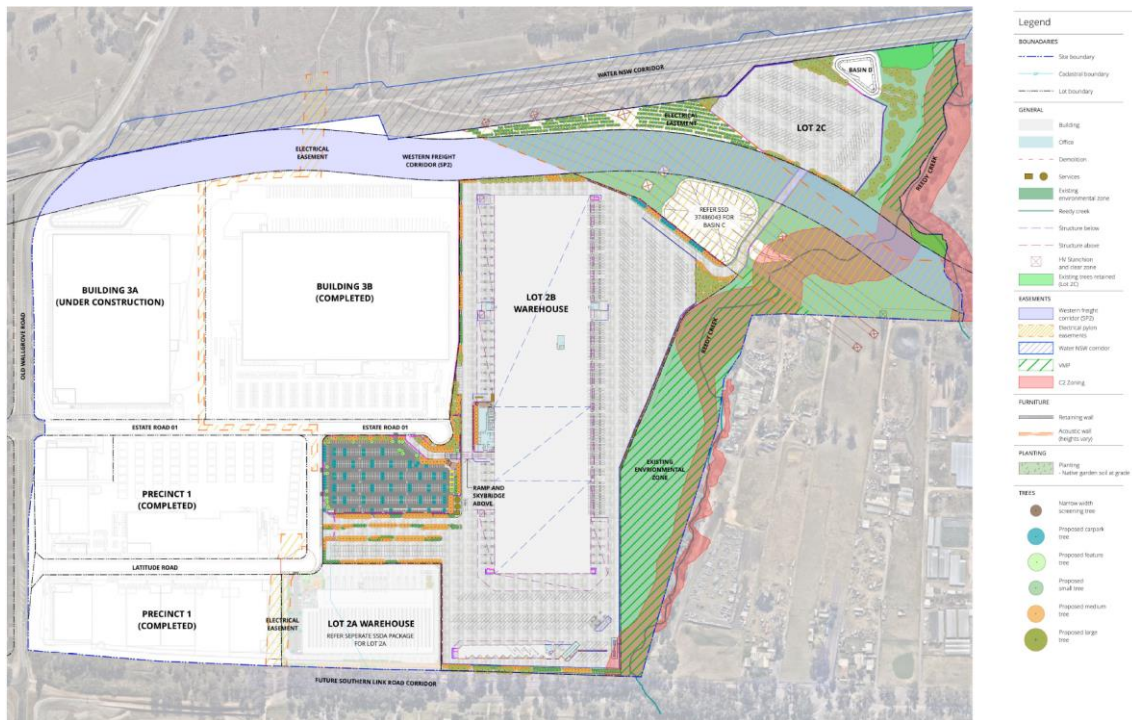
General arrangement landscape plan for Building 2B and Lot C (Source: Scape)
